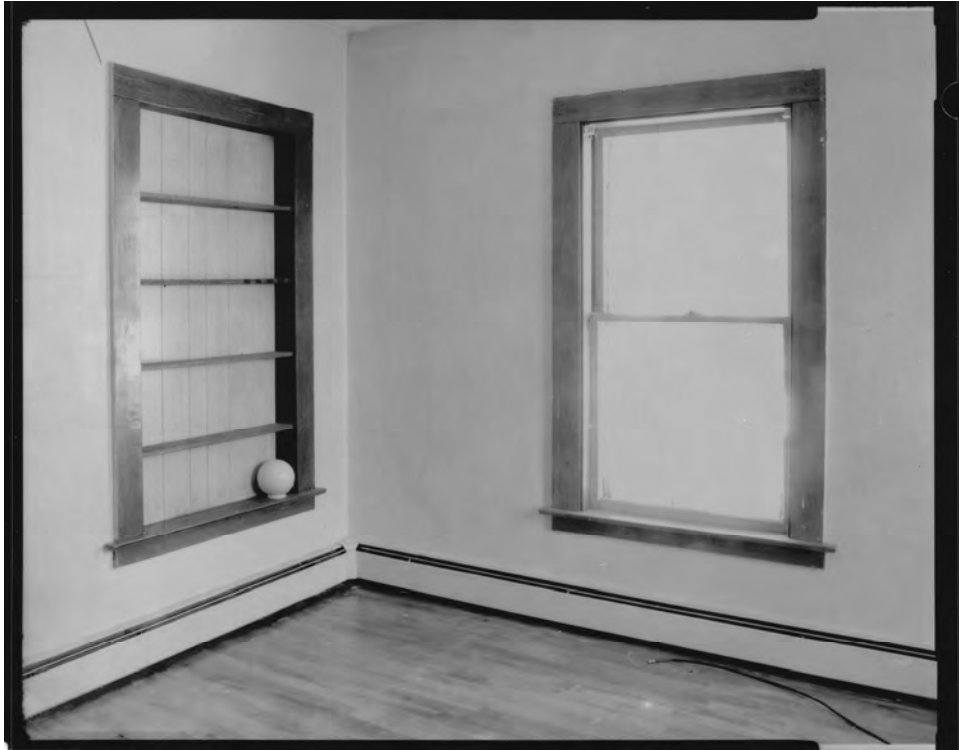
Northwest room, section added at unknown date with blocked window towards porch
